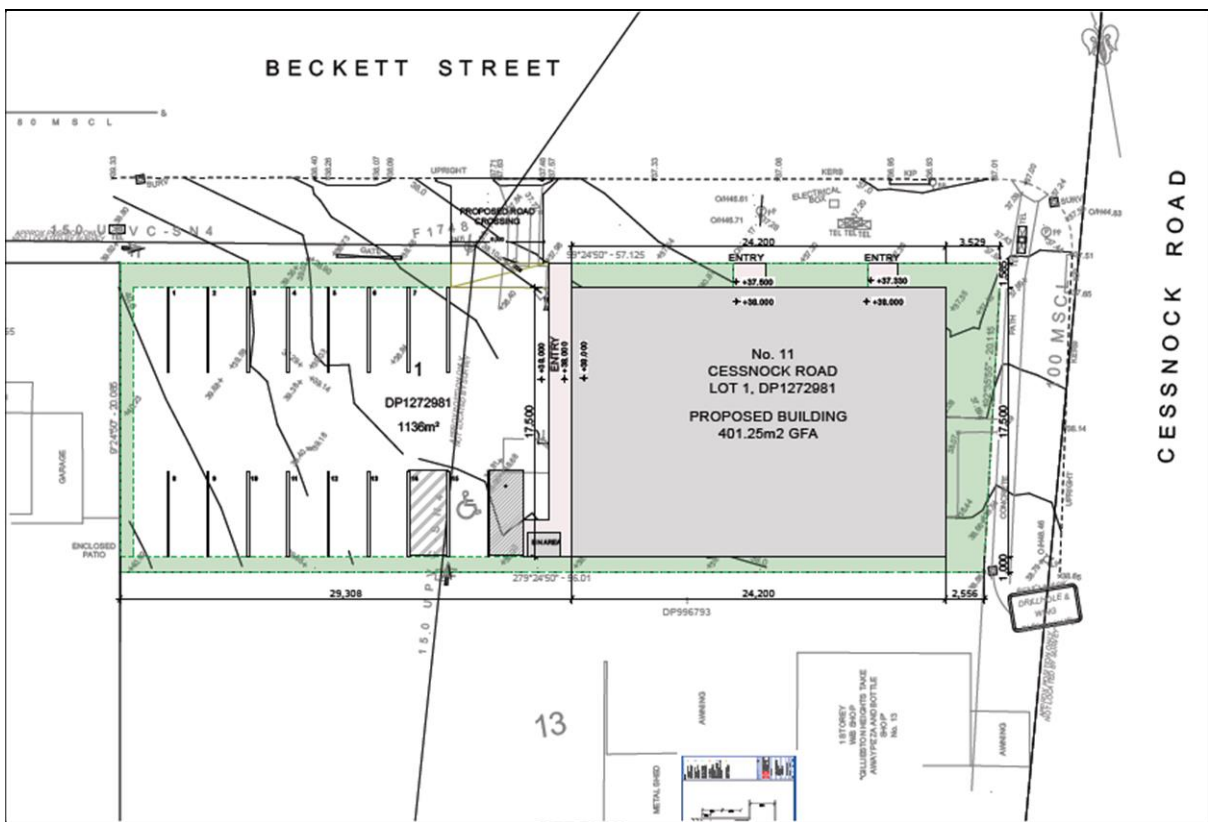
Proposed Site Plan Source: A&H Eco Group Pty Ltd
